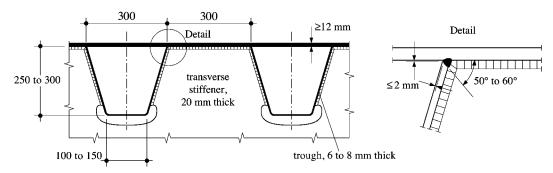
Examples of attaching trough shaped stiffeners to the deck plate and transverse stiffener.
